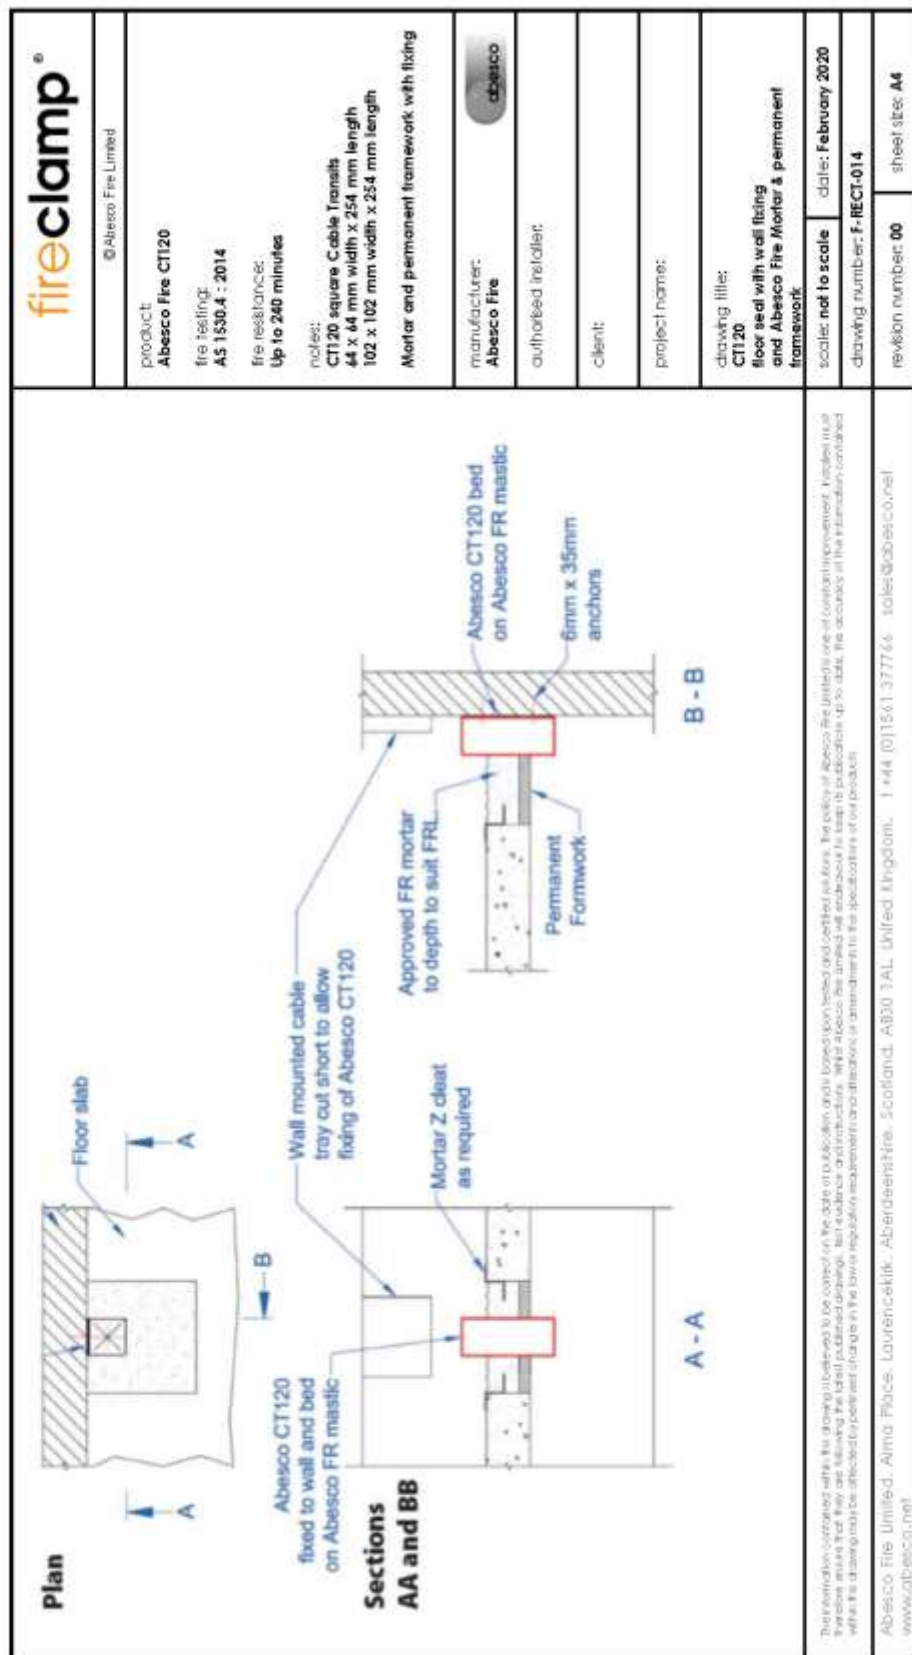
Drawing No. F-RECT-014 – CT120 Floor seal with wall fixing and Abesco fire mortar + permanent formwork
